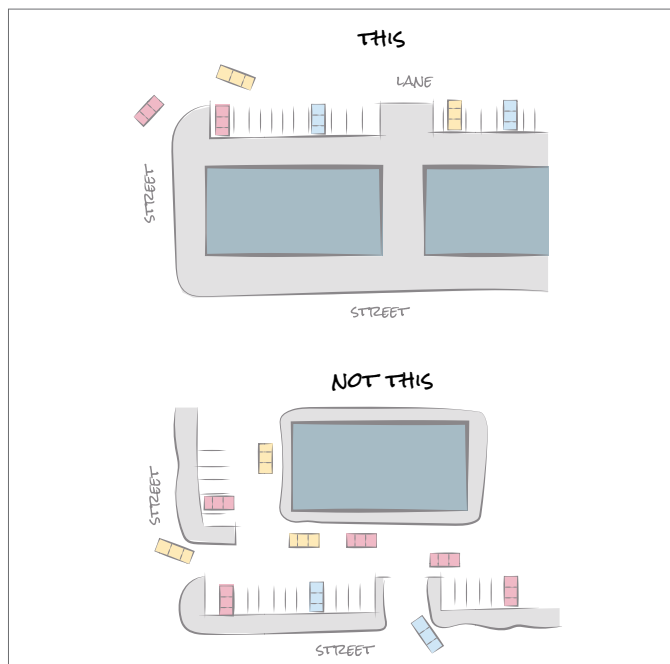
Locate off-street parking to the rear of the building wherever possible (2.1.4 c).
